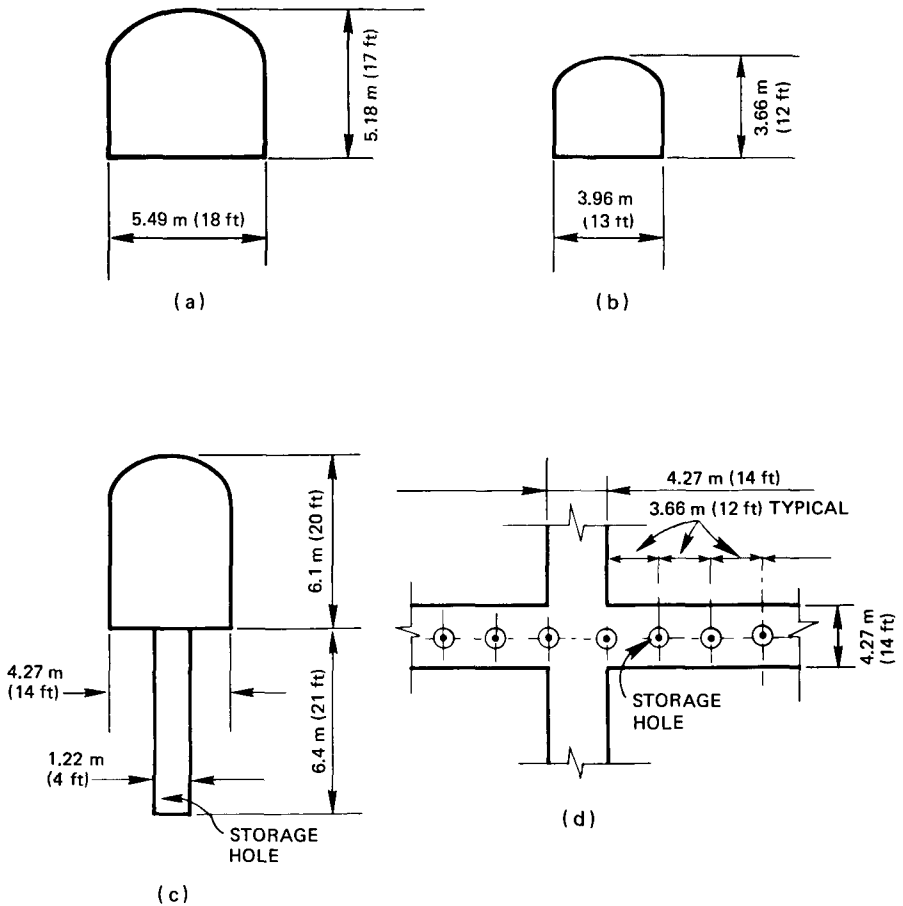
Cross sections and plan of rooms. (a) Mine entry section. (b) Confinement entry section. (c) Storage room section. (d) Storage room plan.
